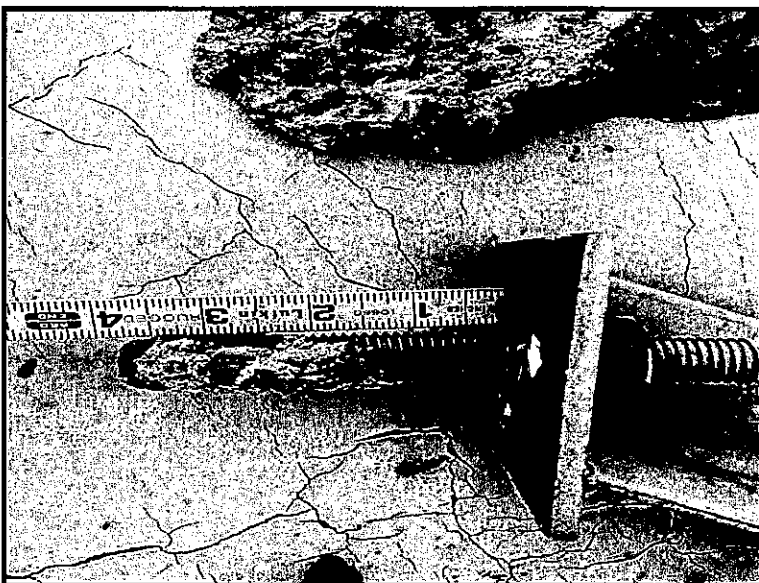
Close-up of Measurement of Retrofit Epoxy Anchor Embedment
